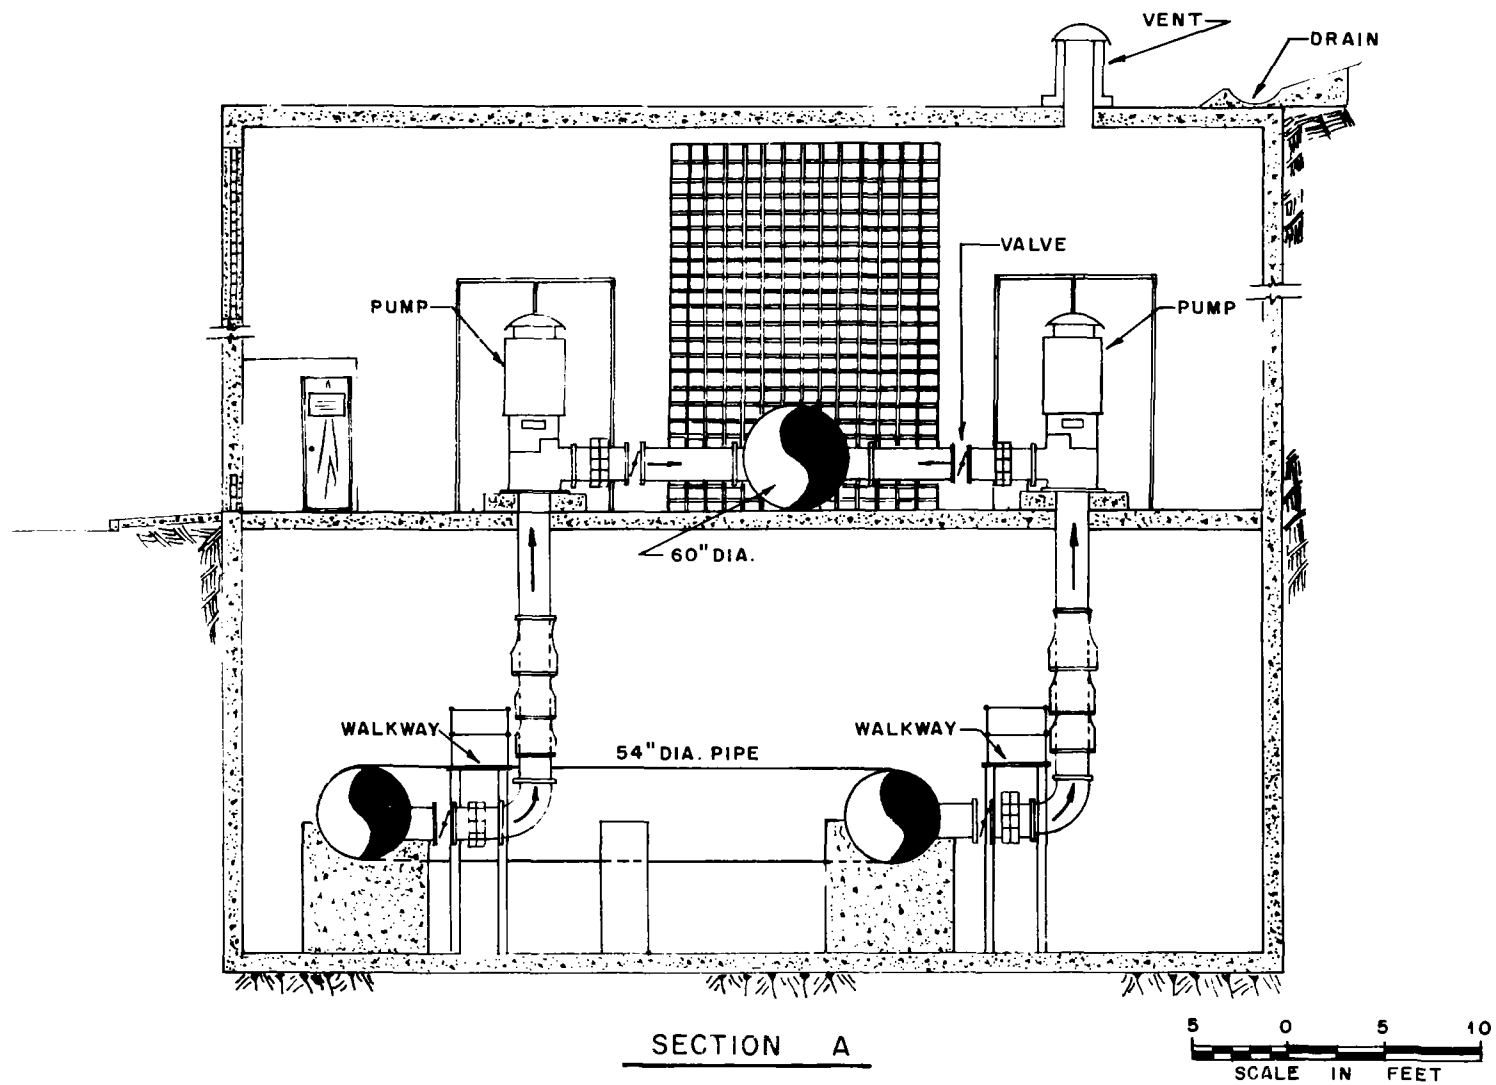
OROUCOUCHE RAW-WATER PUMP STATION — SECTION
